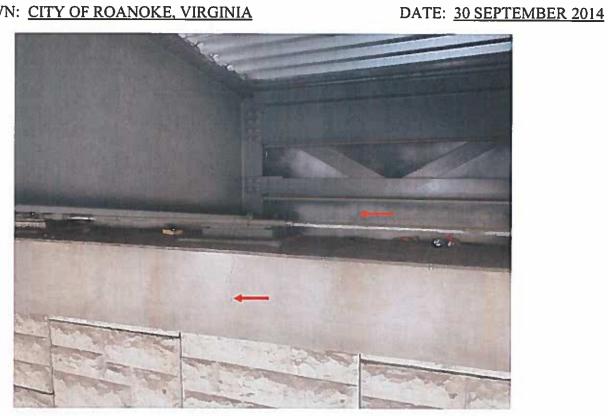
TYPICAL VERTICAL CRACKS IN ABUTMENT BACKWALL AND COPING.
